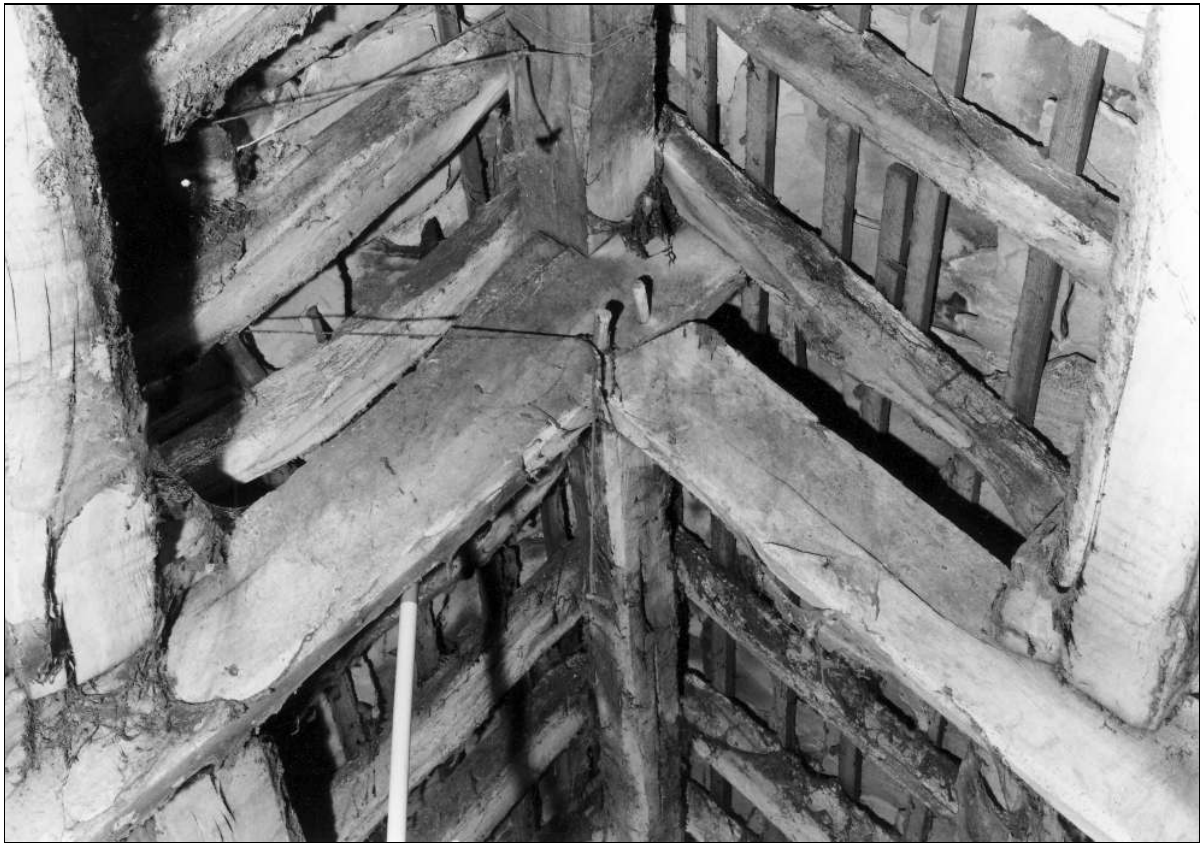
Barn interior: detail of apex of south-west roof truss, from the east (film 5, frame 16)
